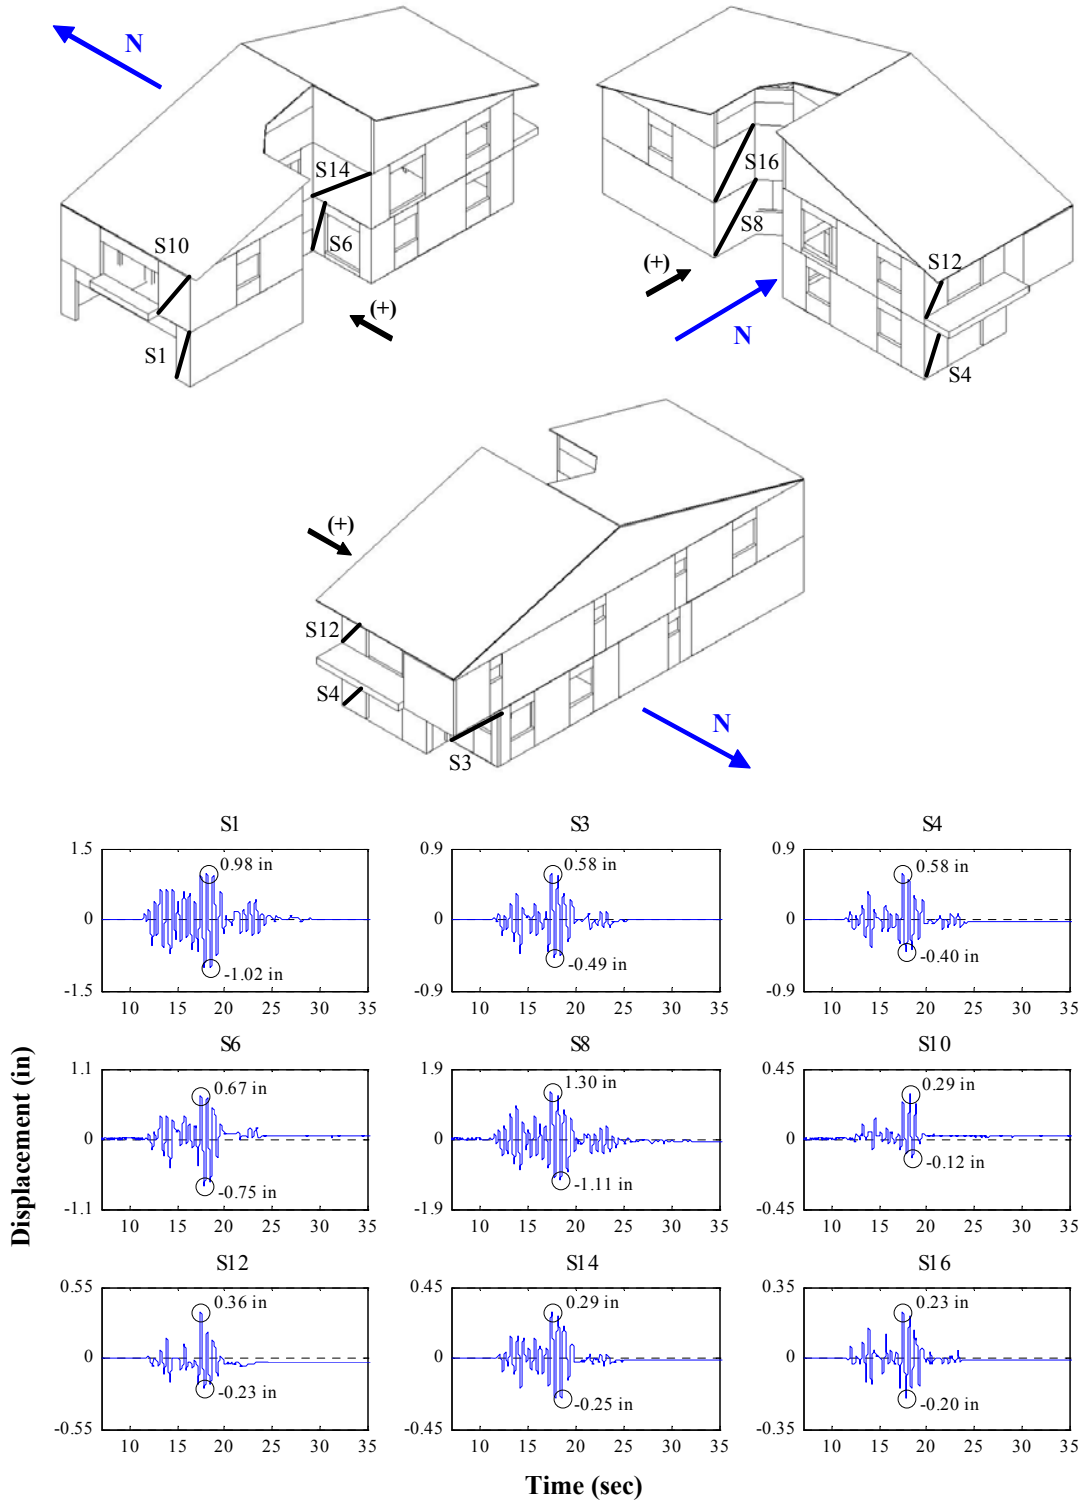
Wall deformations of north-south external walls for Test NWP1S06
